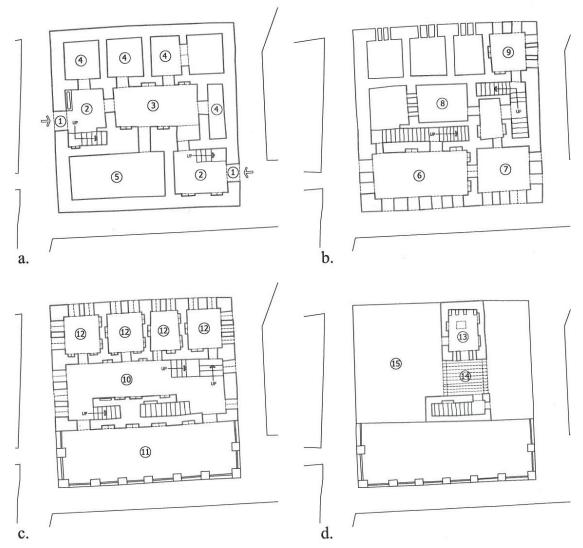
Floor plan of *Bait al-fouq*; *a*. Ground floor; *b*. Mezzanine level; *c*. First floor; *d*. Roof level; 1. main entrance door; 2. First *dahreez*; 3. Second *dahreez*; 4. *suffah*; 5. *darss*; 6.*sblah*; 7.small *sablah*; 8. *sark*; 9. guest room; 10.*arshah*; 11 terrance; 12.*gurafah*; 13. kitchen; 14. shade; 15. roof
